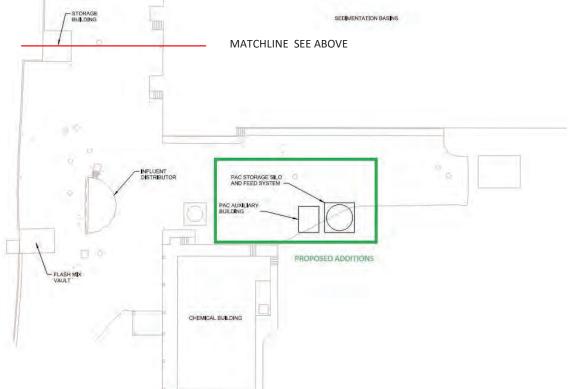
Figure A: Bountiful Weber Basin Water Conservancy District at 38 N Davis Blvd., Proposed Site Plan 2024
